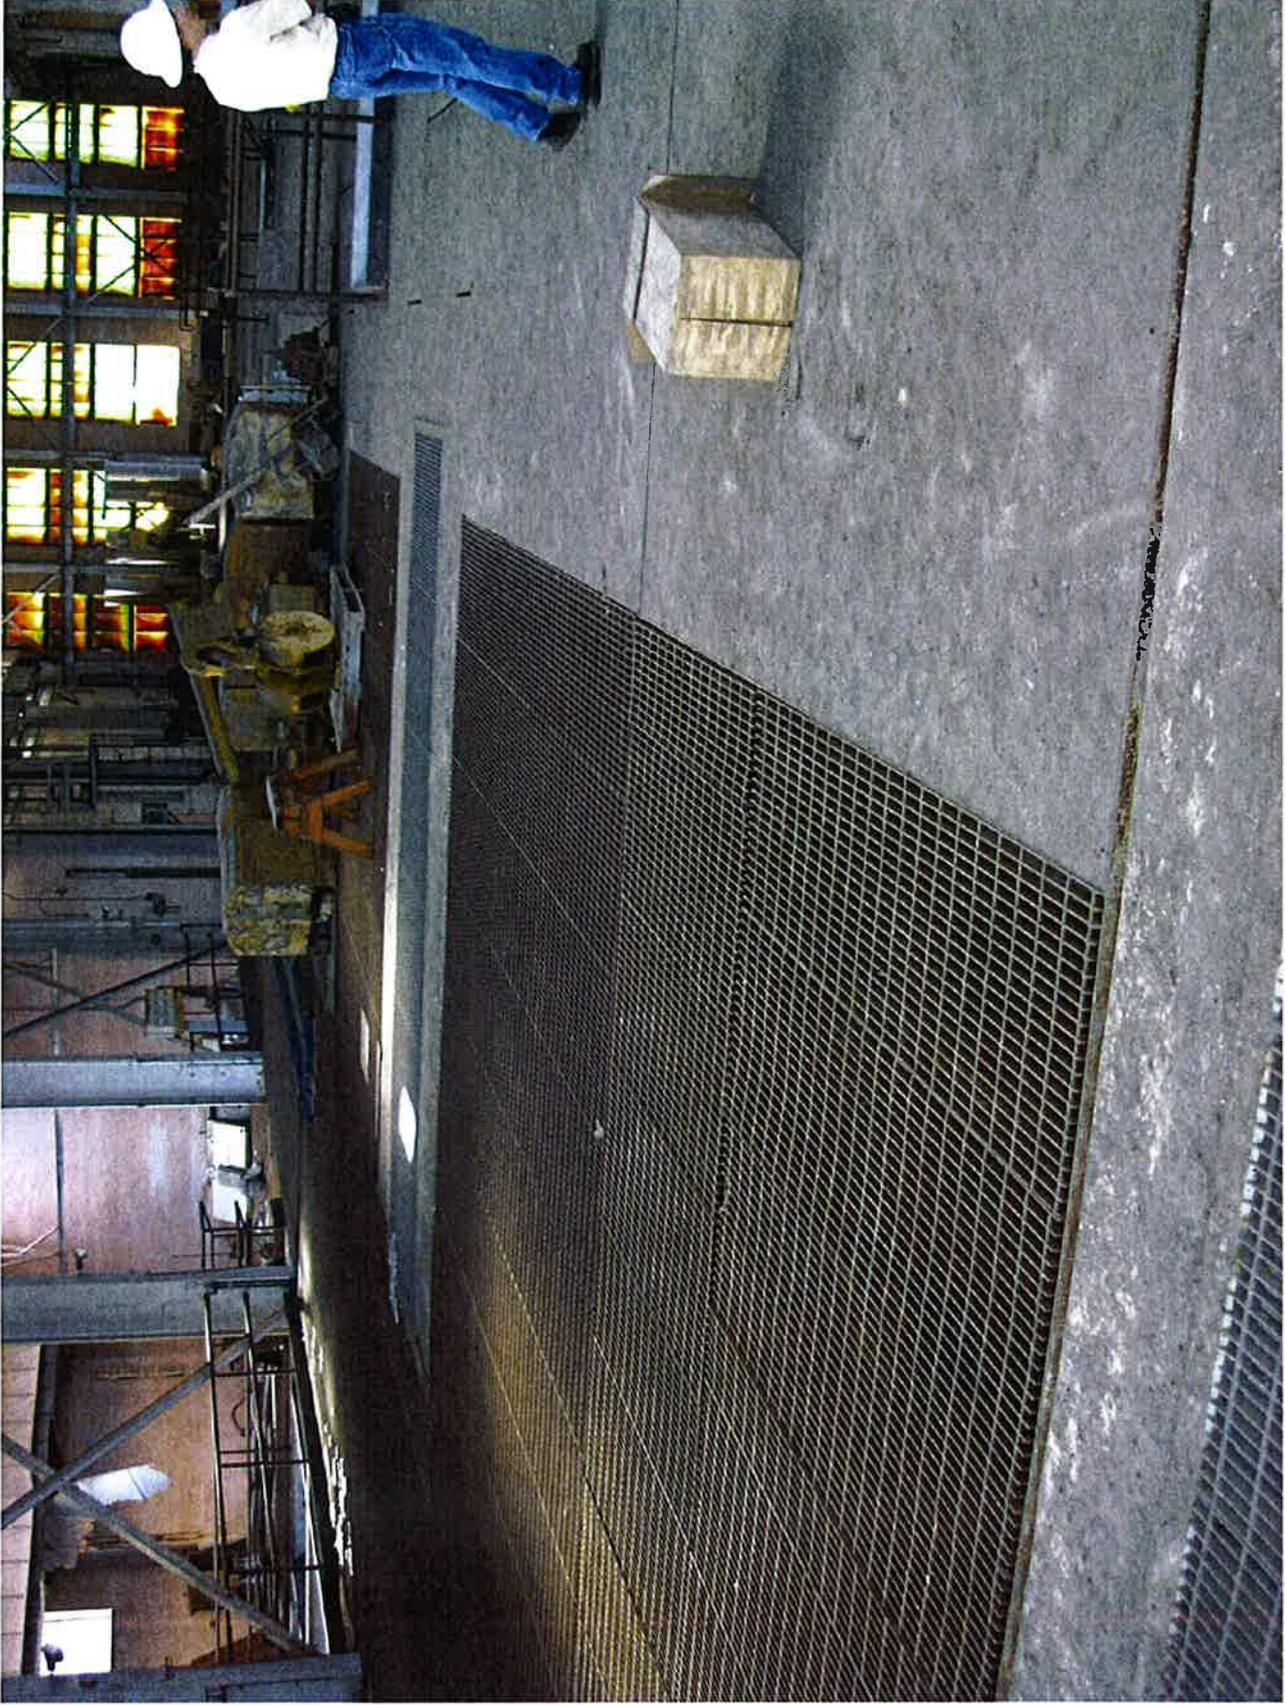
VIEW OF GRATED TURBINE LEVEL AT SECOND FLOOR OF EAST HALF OF BUILDING 25
